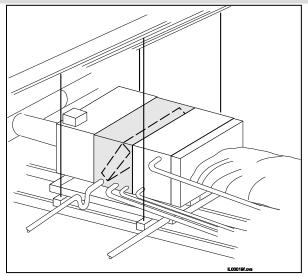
Horizontal installation with *Unico System* Heating Module and Blower Module
